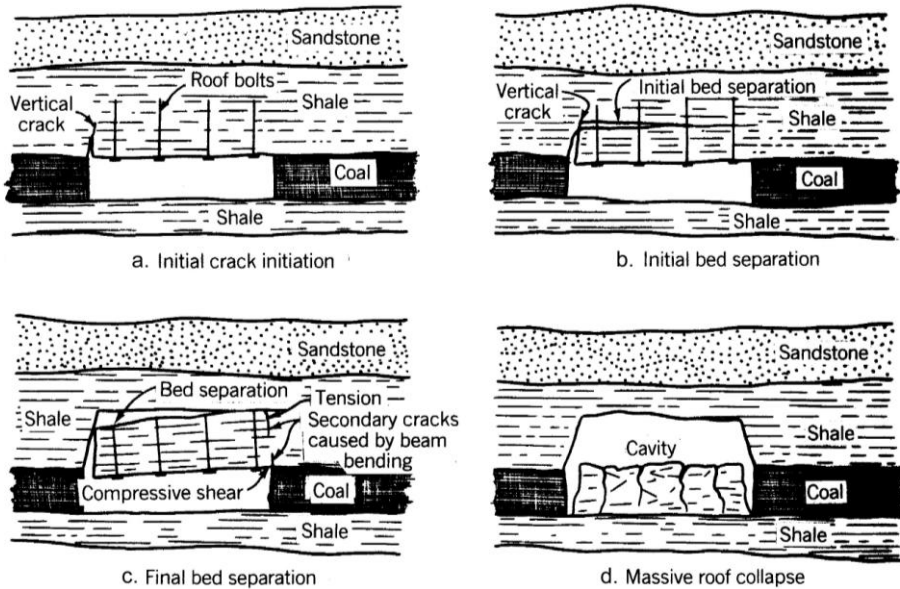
propagation of cutter roof leading to roof fall (Kripakov, 1982)
